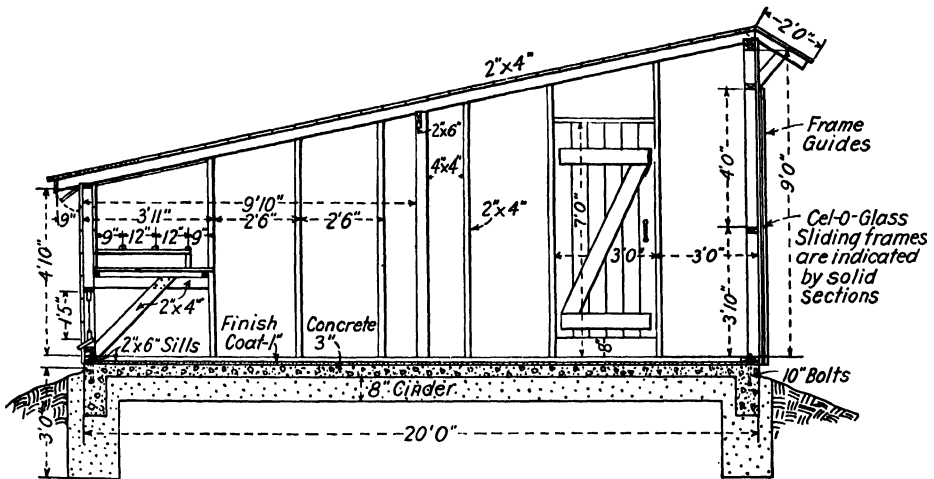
Cross-section view of New Jersey multiple-unit laying house, showing shed-roof type and concrete floor detail. (Sketch by Acetol Products, Inc.)
